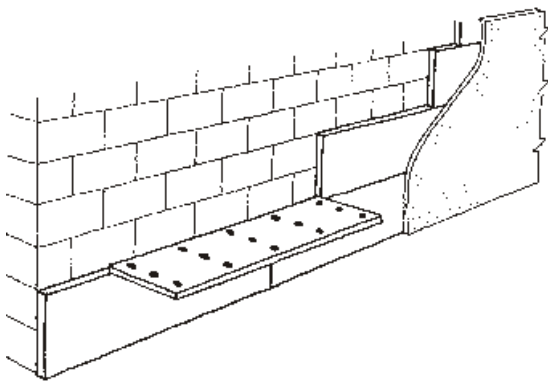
Supplementary insulation on a masonry wall. The slabs are fixed by mortar.
